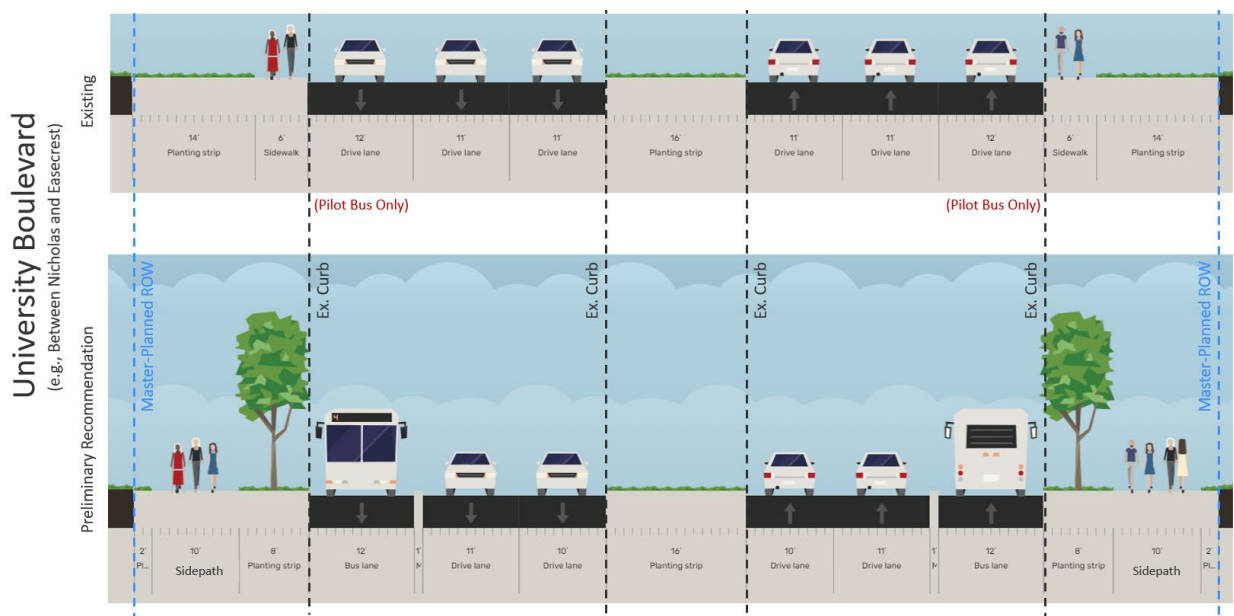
Existing and Proposed University Boulevard Cross-Sections
